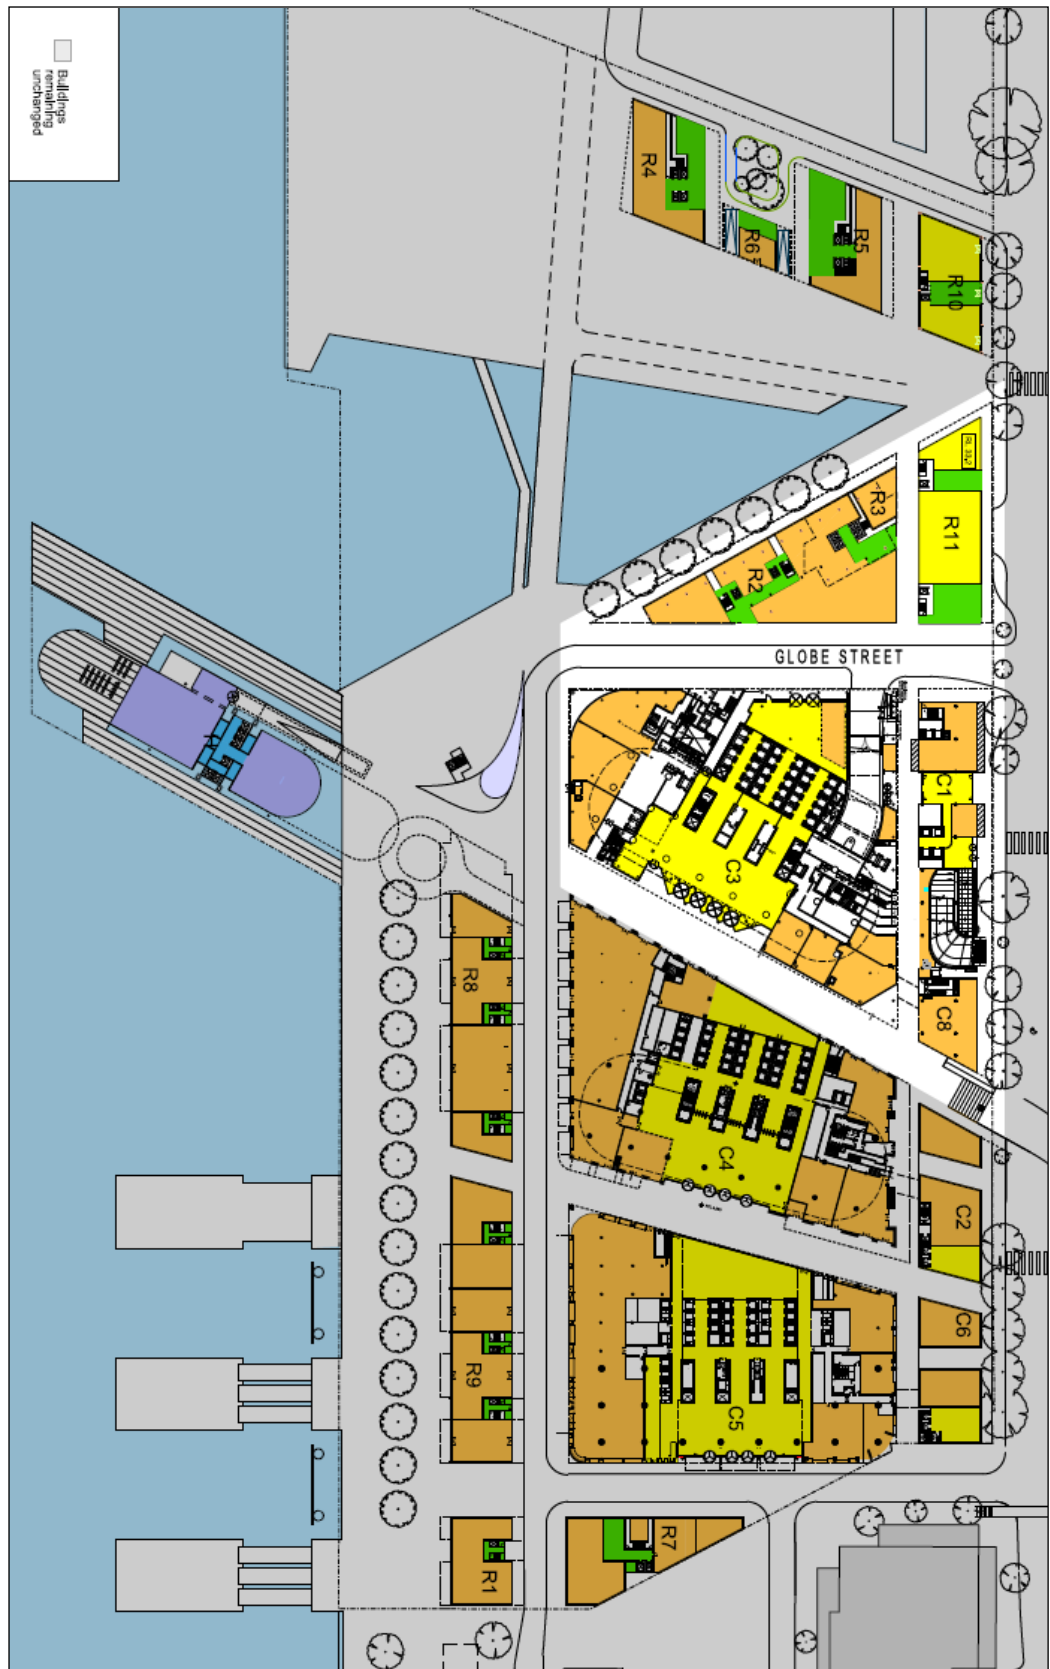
Ground floor layout of the blocks as proposed under MOD 6 (Source: Lend Lease).
